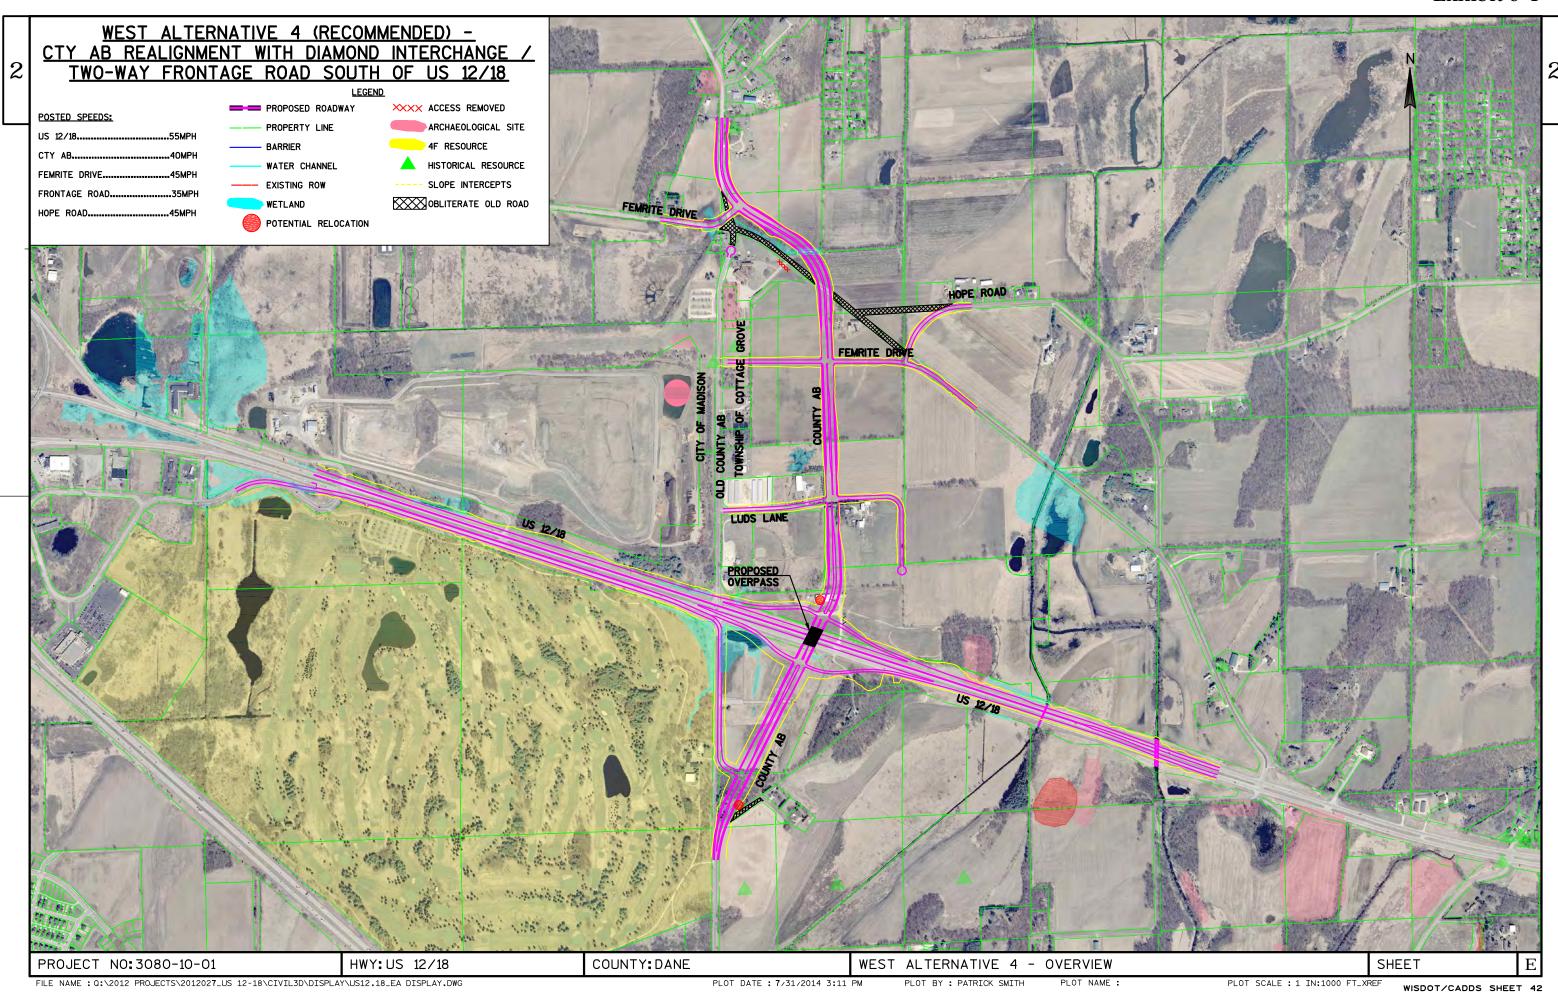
WEST RECOMMENDED ALTERNATIVE & TYPICAL SECTIONS
